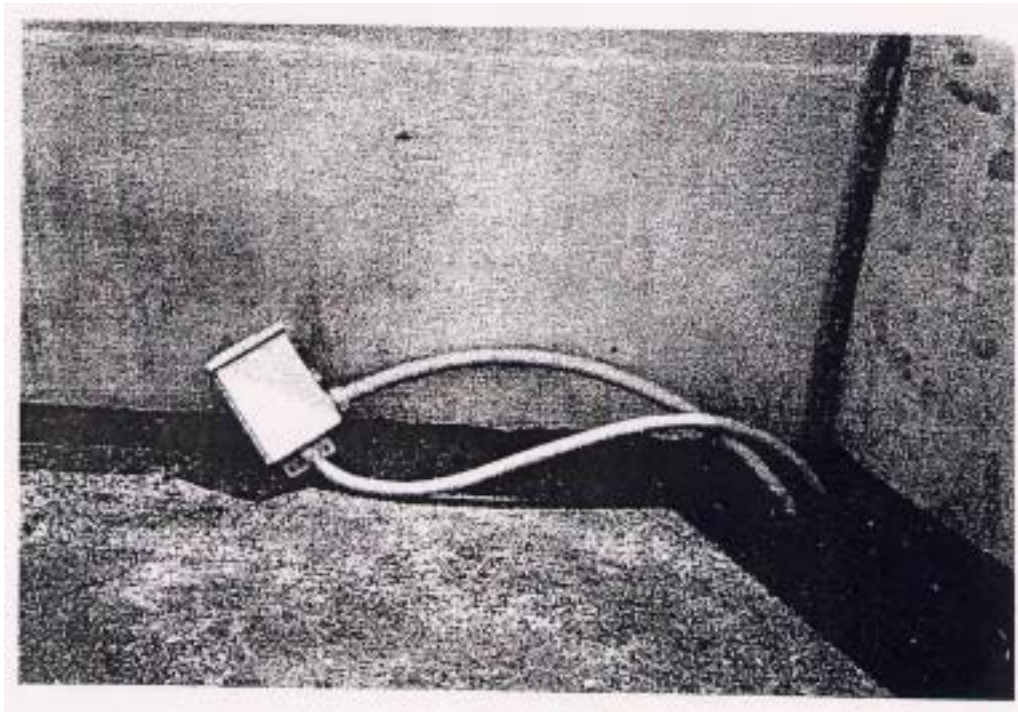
Conduits and Enclosure – Wyckoff Road Eastbound
